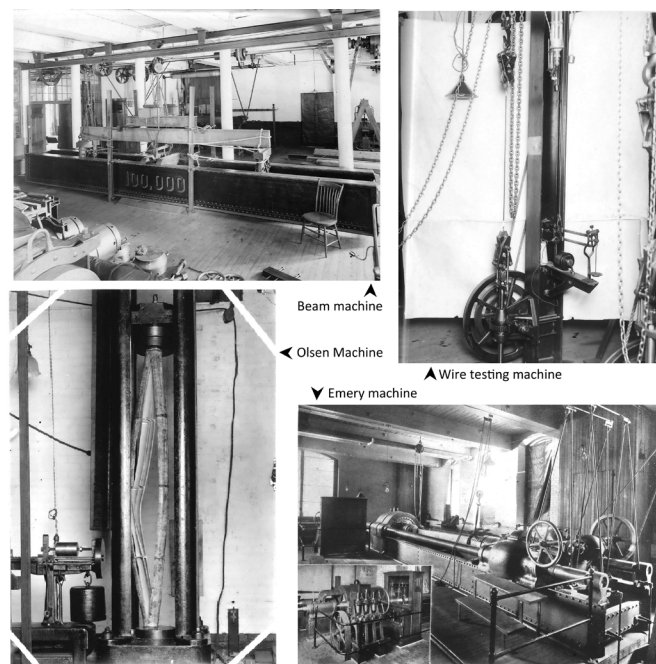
The MIT instruments used for testing, 1913-14. Source: Chow, “Bamboo,” 1, 13, 31, 66.
